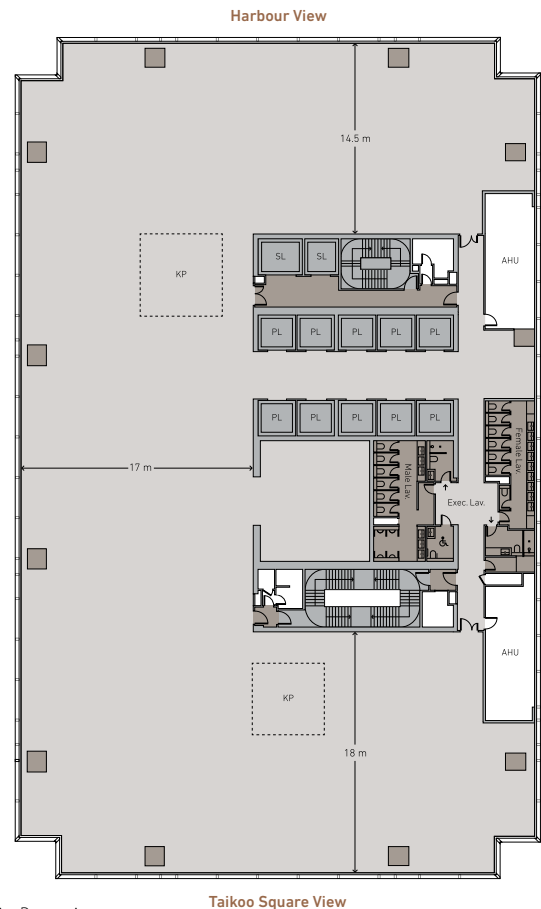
Typical high-zone floor plan. © Swire Properties
